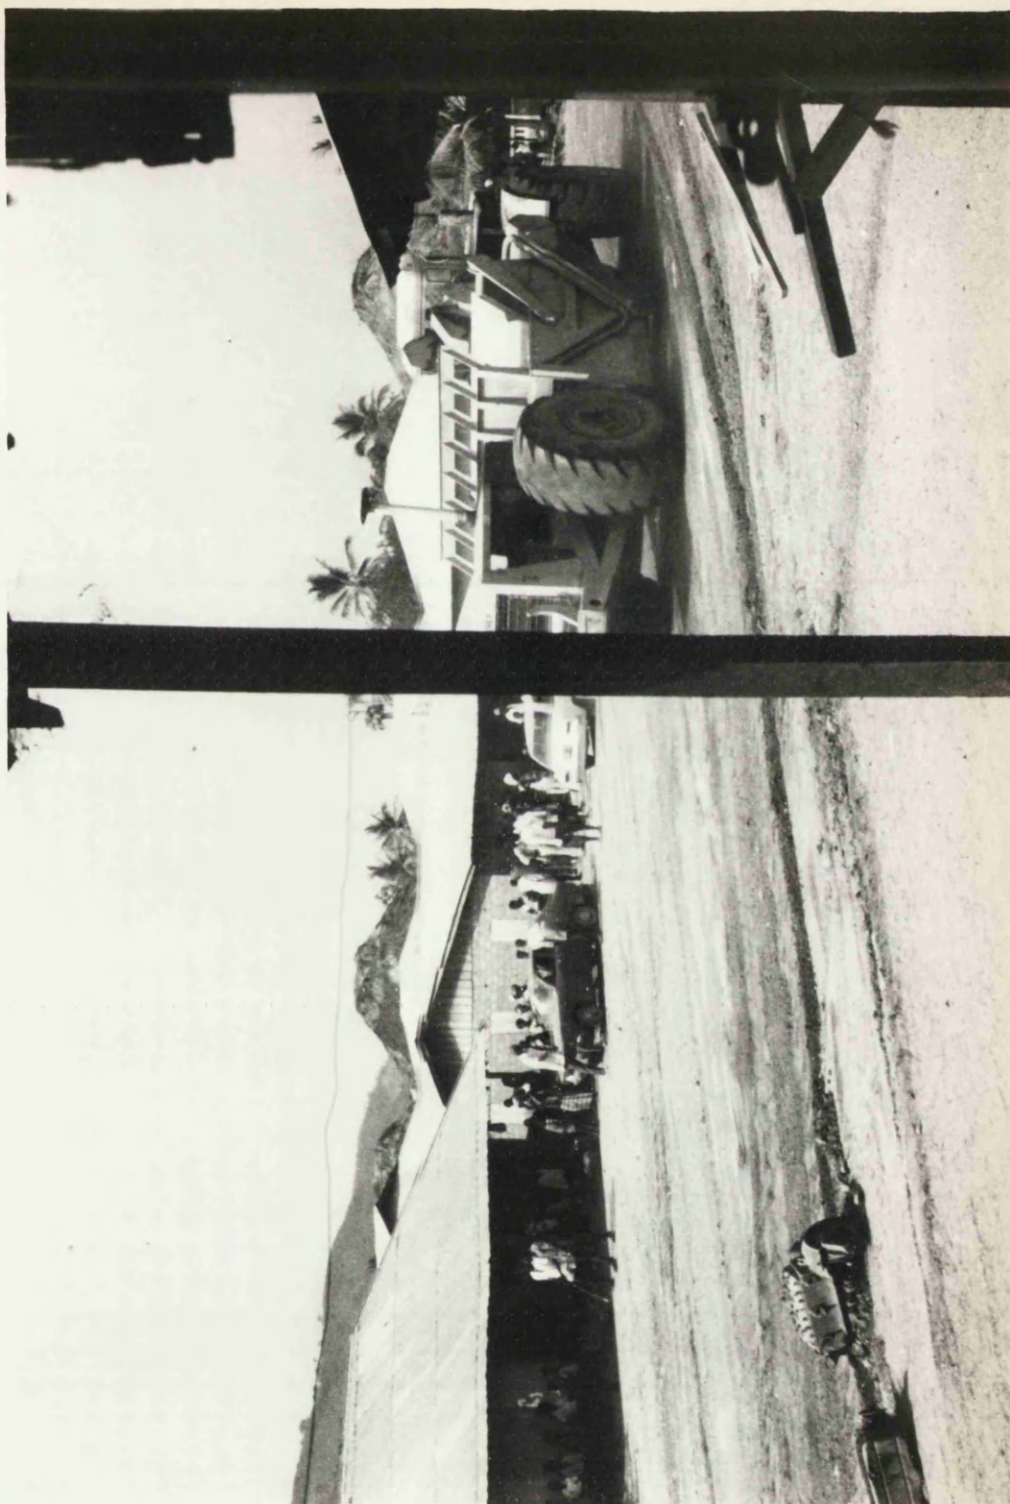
Road Building in Jaiama Nimikoro. A NDMC grader levelling the road prior to a tarred surface being laid
